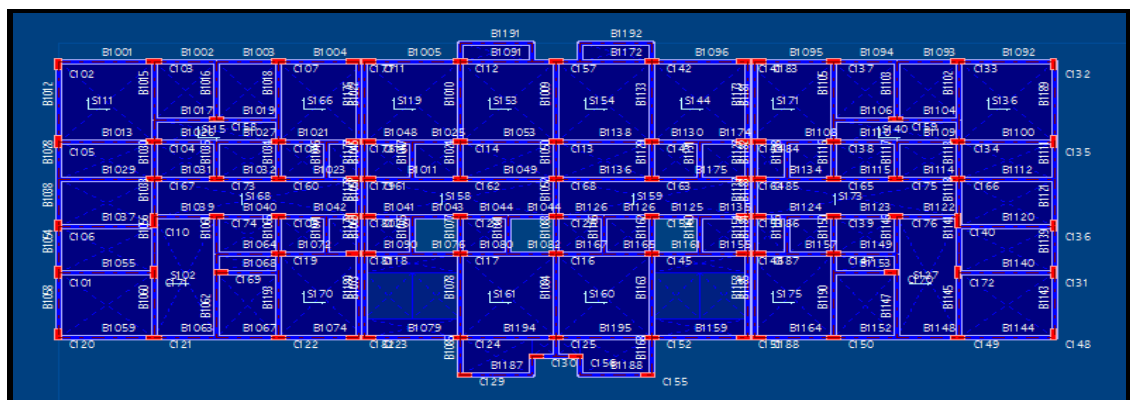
Plan Layout of the Case Study with STA4-CAD
